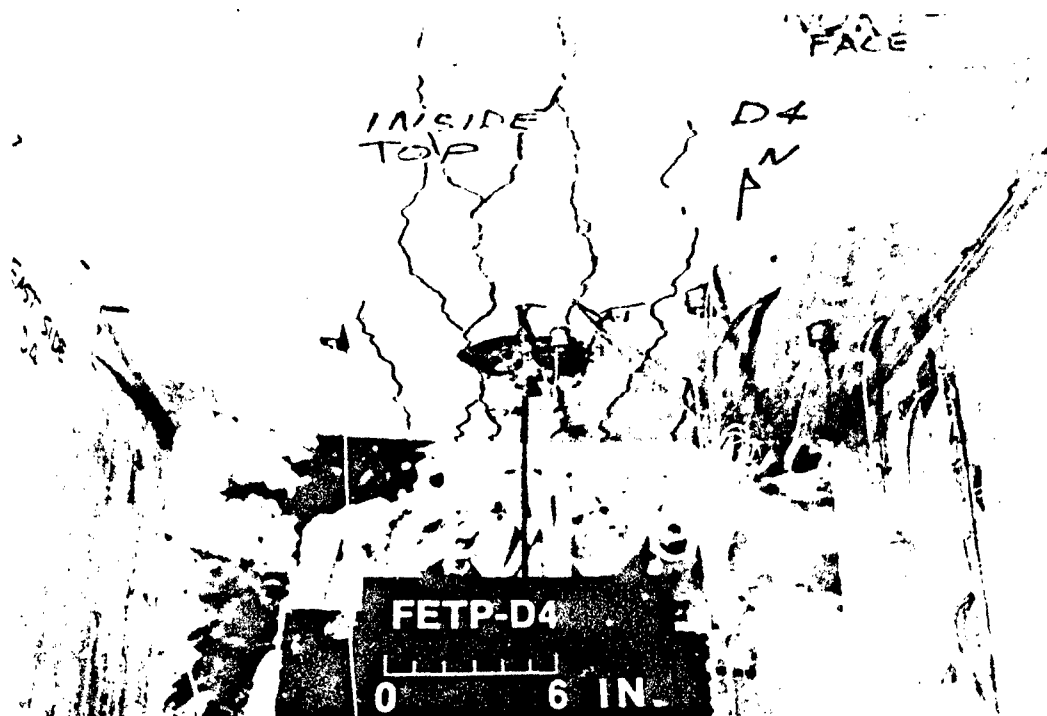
Midspan roof cracking, Test D4.
